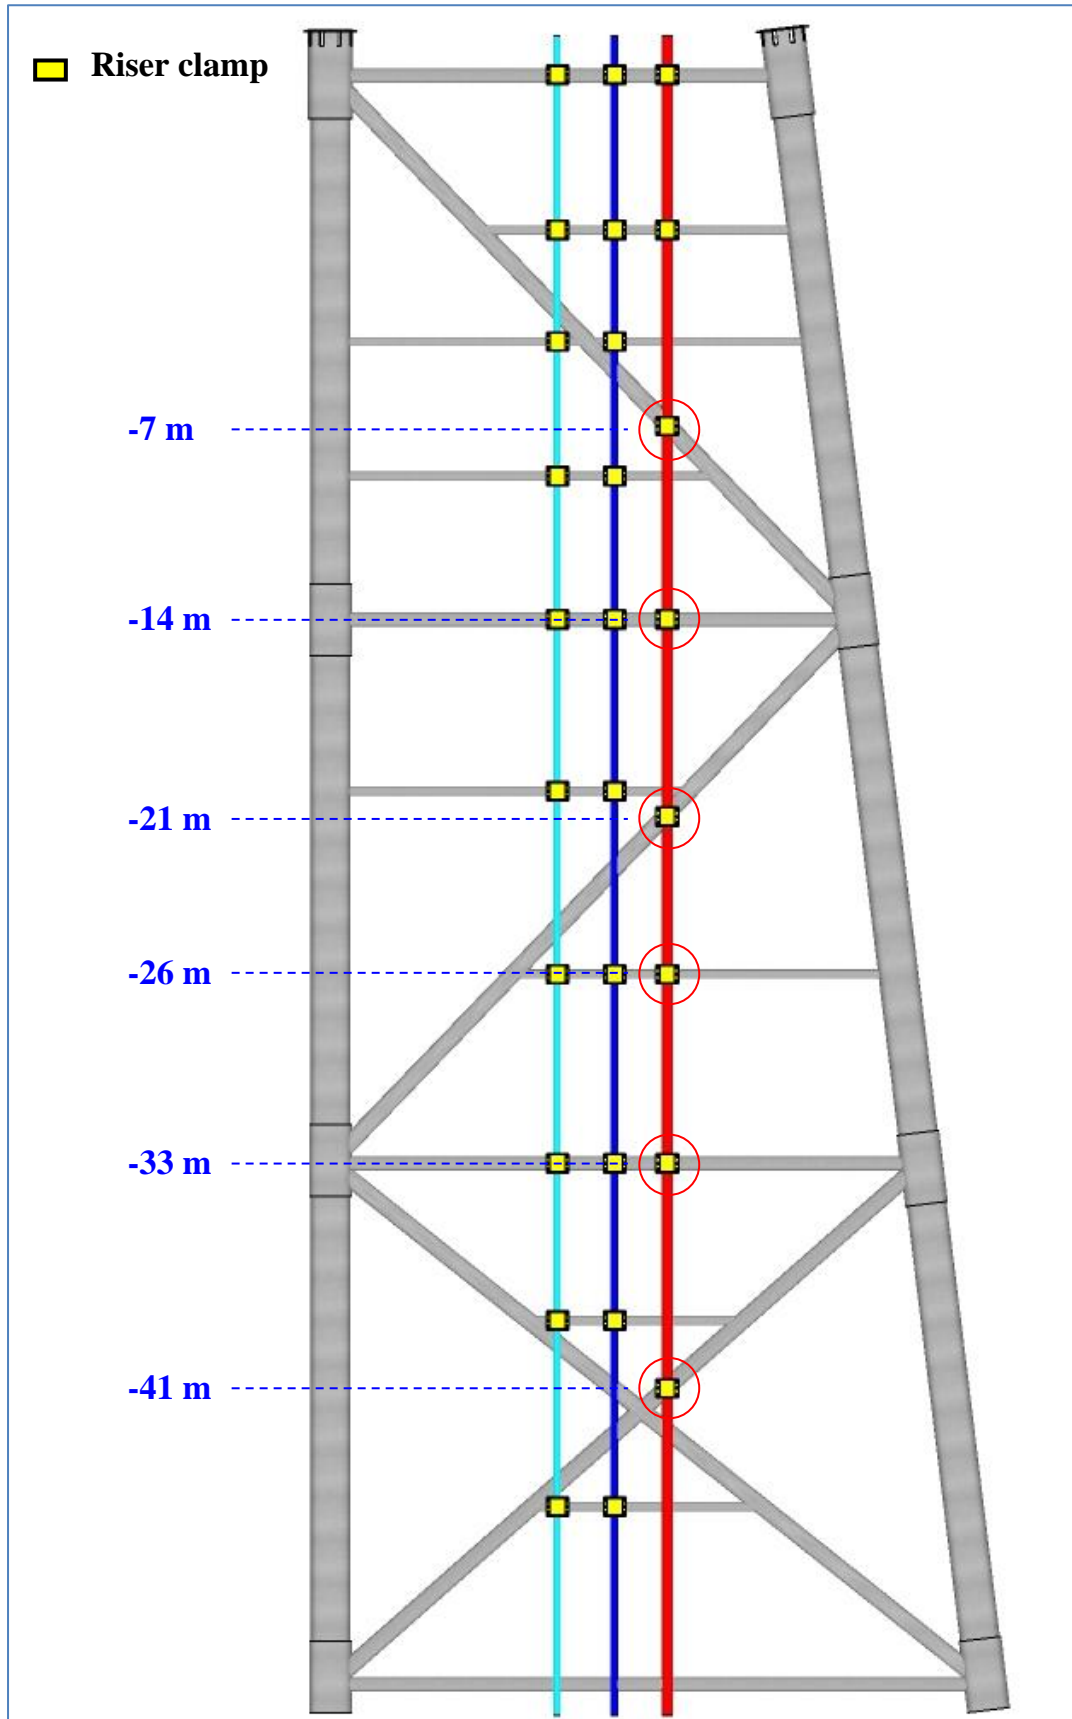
Elevation view of Riser and riser clamp position at RC.RB1
